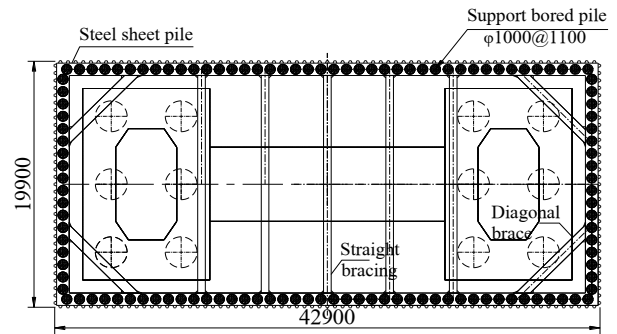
The plane schematic diagrams of the foundation pit supporting structure
